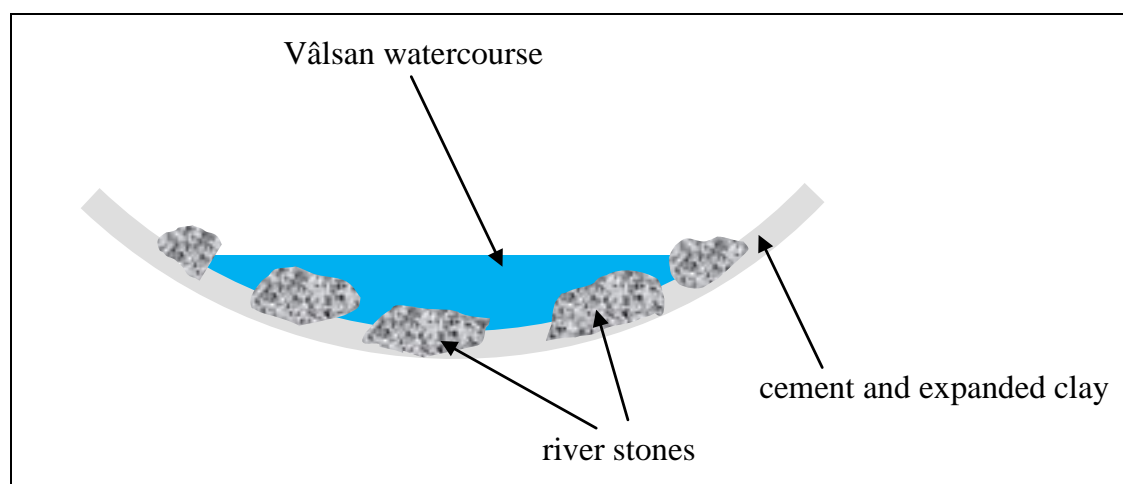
The new reconstructed riverbed with fixed boulders in a mixture of cement and expanded clay at the base (transversal section).
